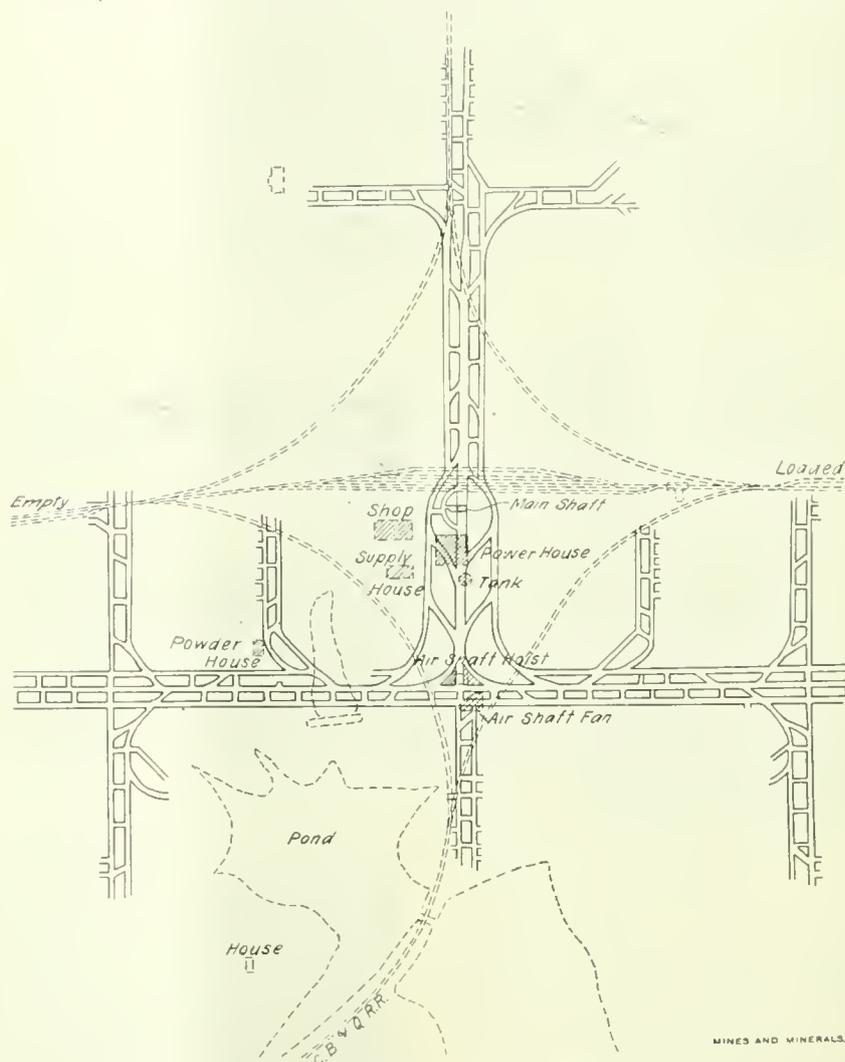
SURFACE AND UNDERGROUND PLAN, SURFACE WORKS SHOWN DOTTED
